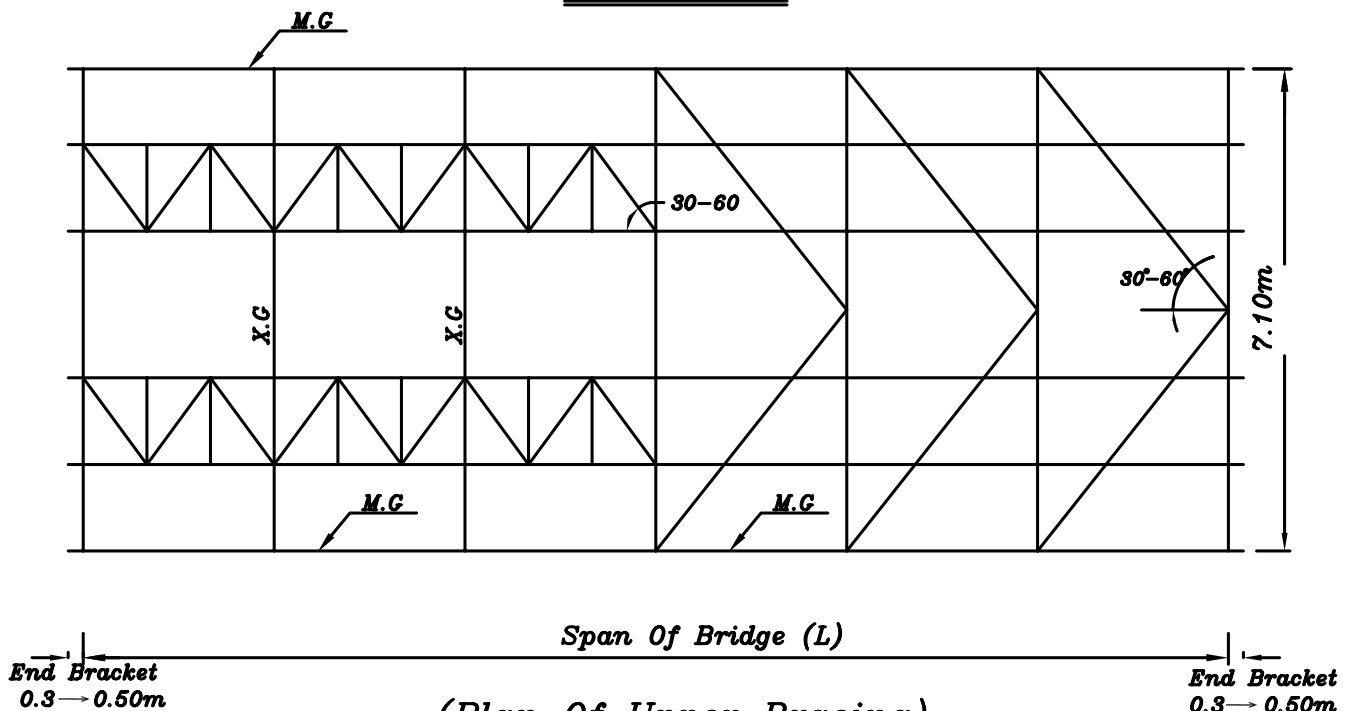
# PLATE GIRDER DECK BRIDGE RAIL WAY WITH INVERTED U-FRAME (DOUBLE TRACK)
